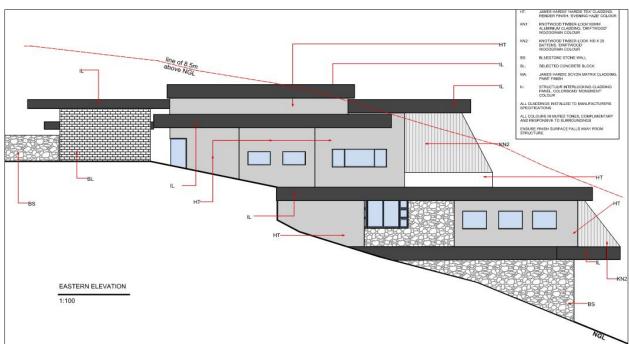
Eastern elevation of 3 Chalmers Lane (Source: Layton Design)
